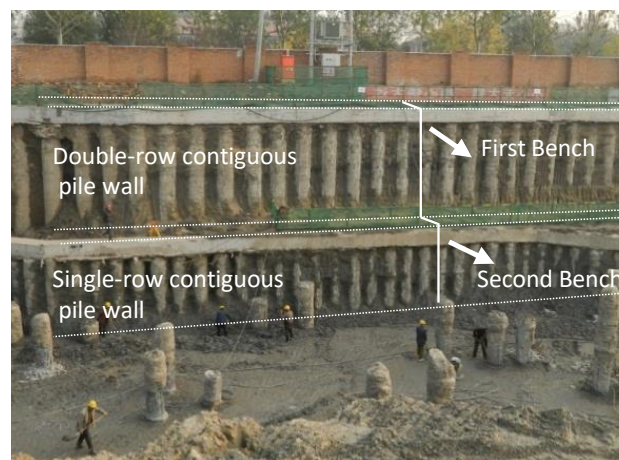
Photograph of an example two-bench excavation supported by contiguous bored pile walls
